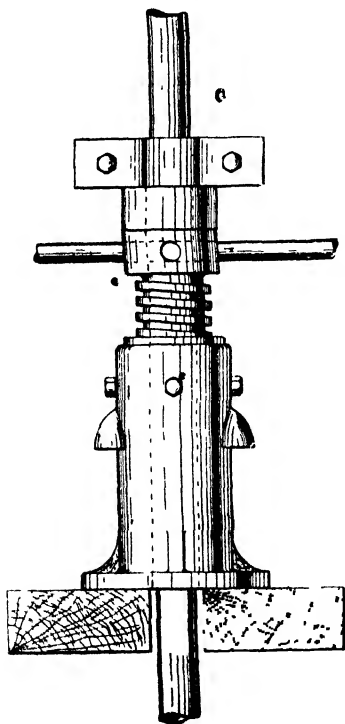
F.—HOLLOW JACK FOR WITHDRAWING TUBES.
